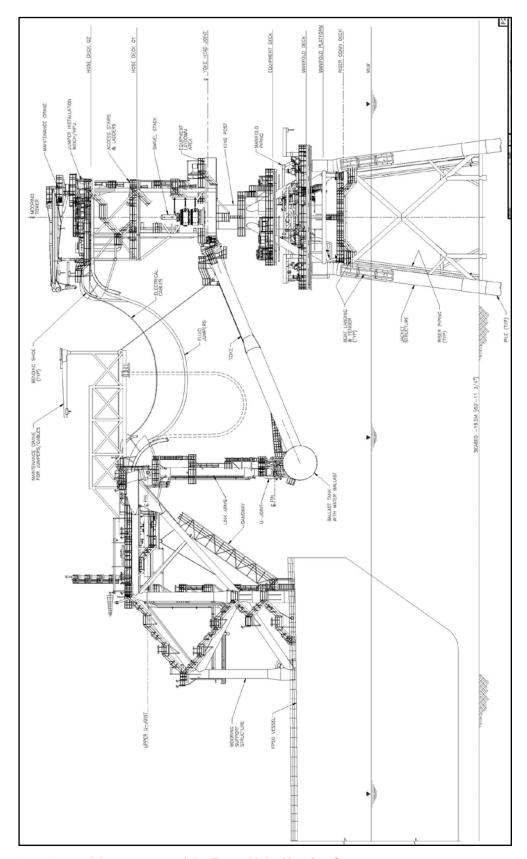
General Arrangement of the Tower Yoke Mooring System
